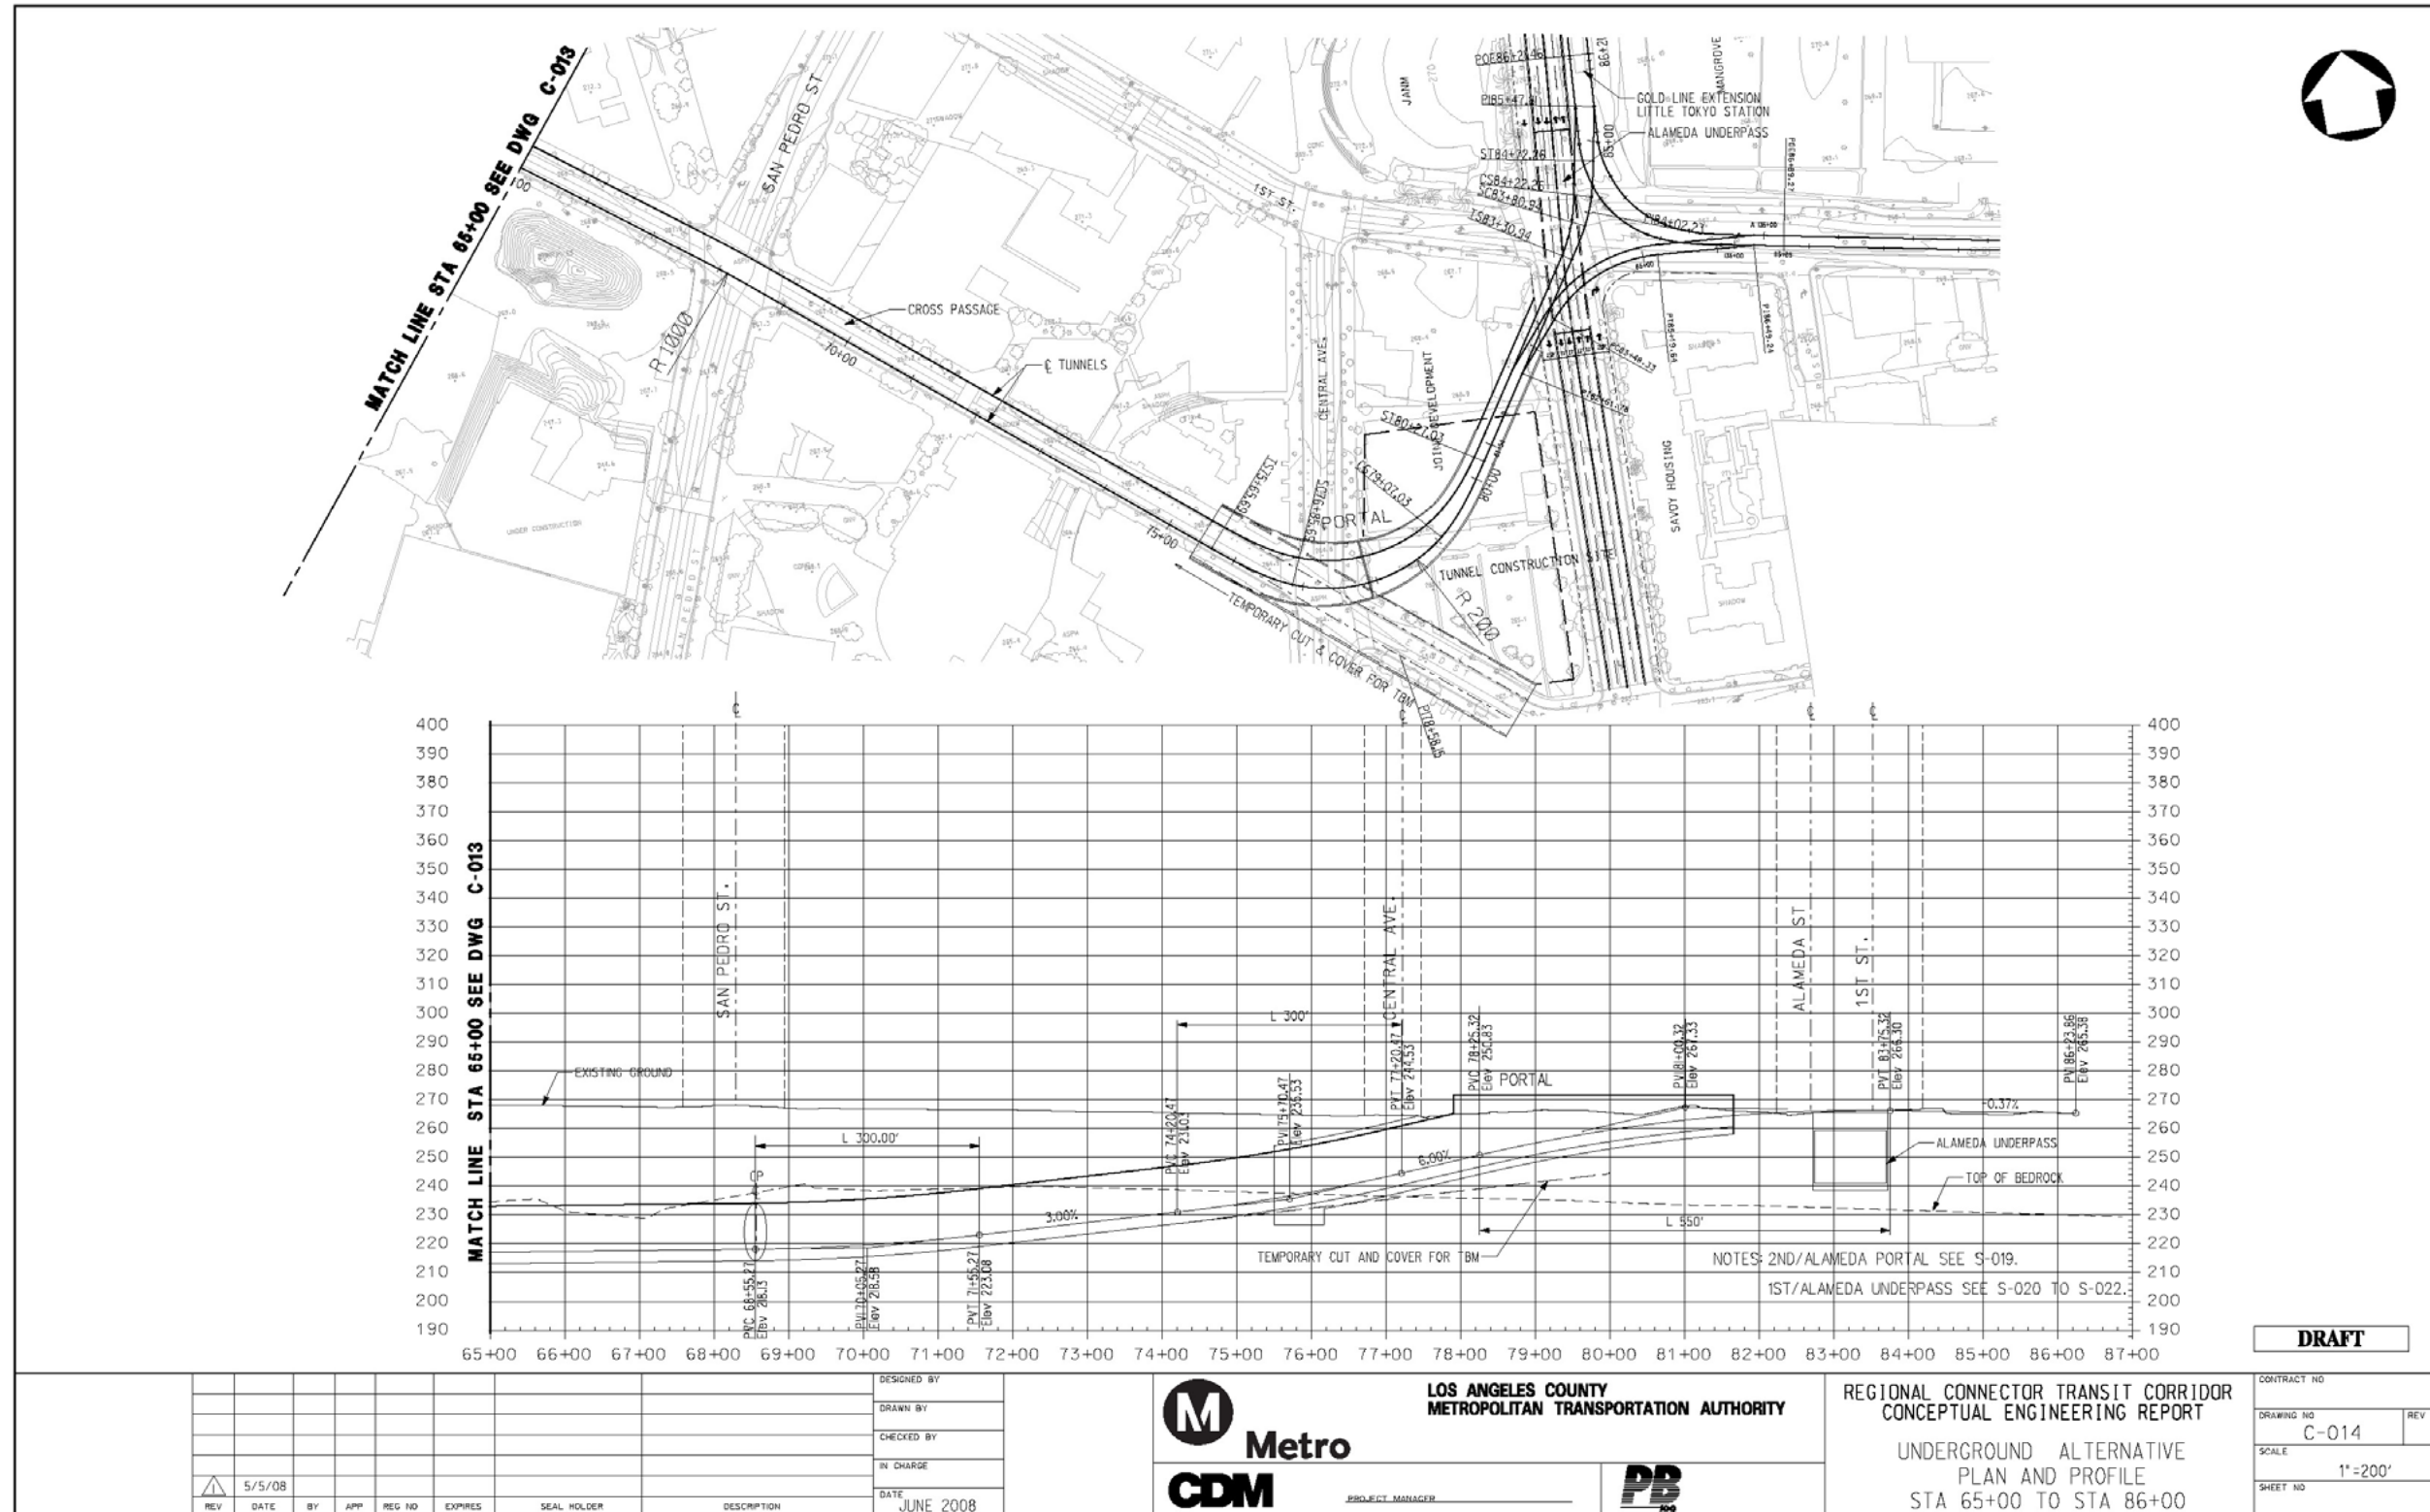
Underground Emphasis LRT Alternative: 1st St. and Alameda St. intersection and Underpass
